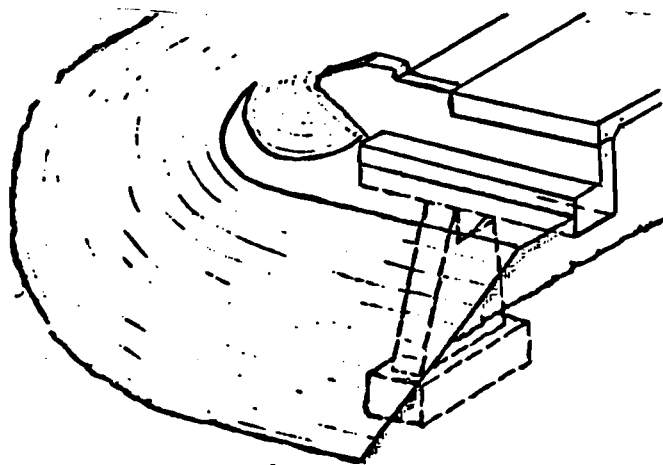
Typical spill-through or open abutment (from Ref 2).
